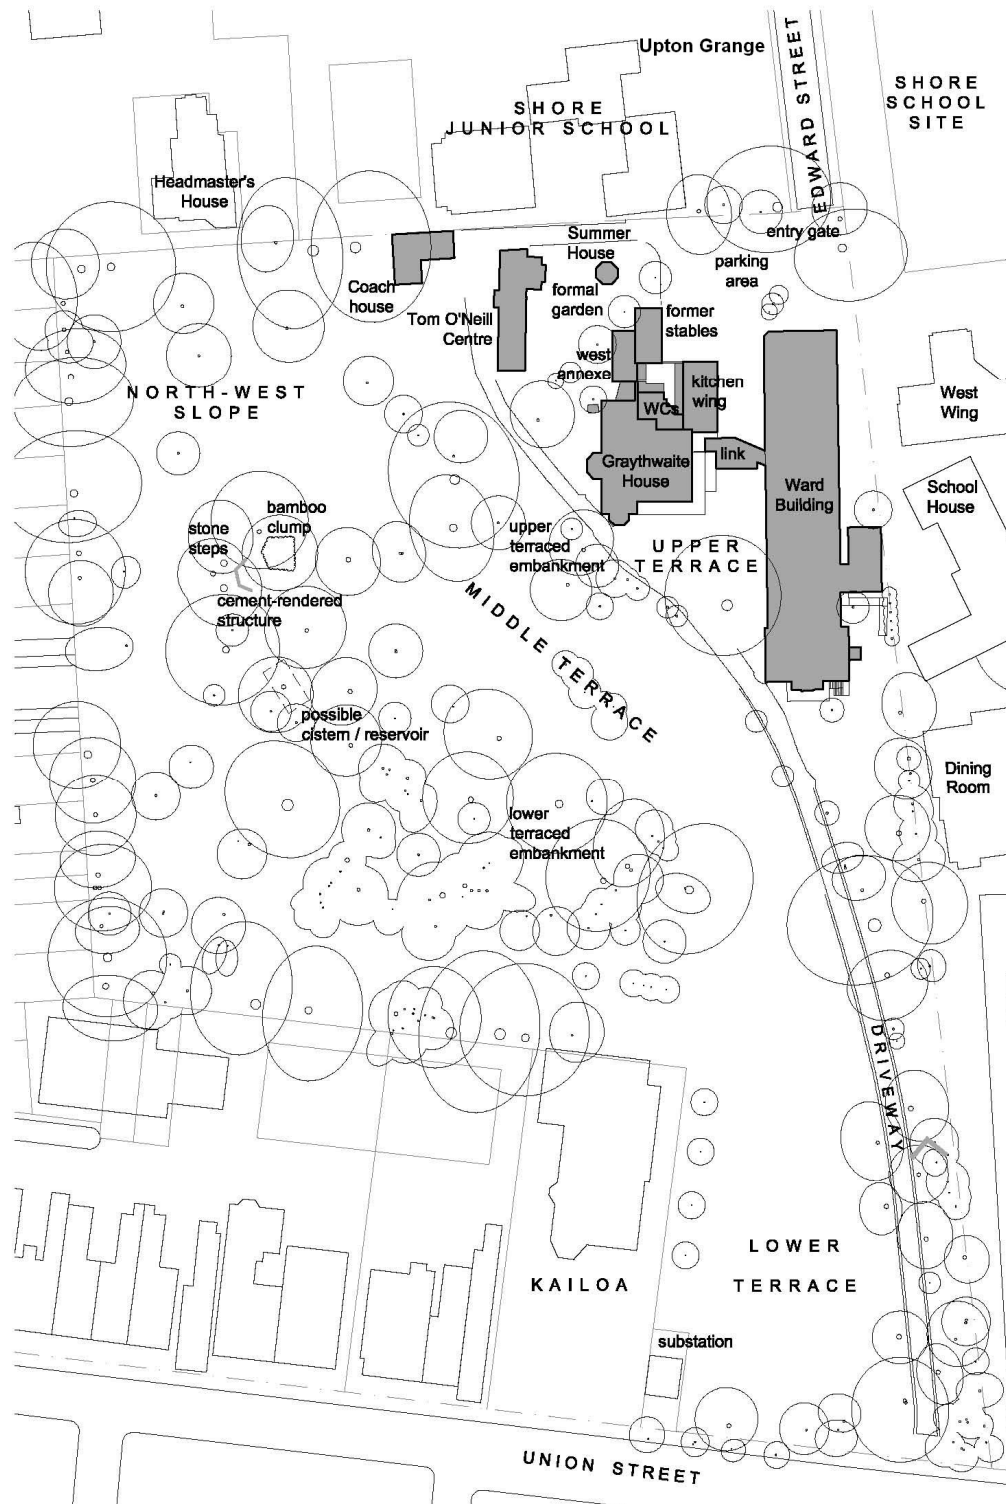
Site Plan for Graythwaite, with key structures shaded. The footprint of adjacent buildings on the Shore School site, including the West Wing, School House and Dining Room and Upton Grange on the Preparatory School site, and residential properties are also shown. Not to scale.
